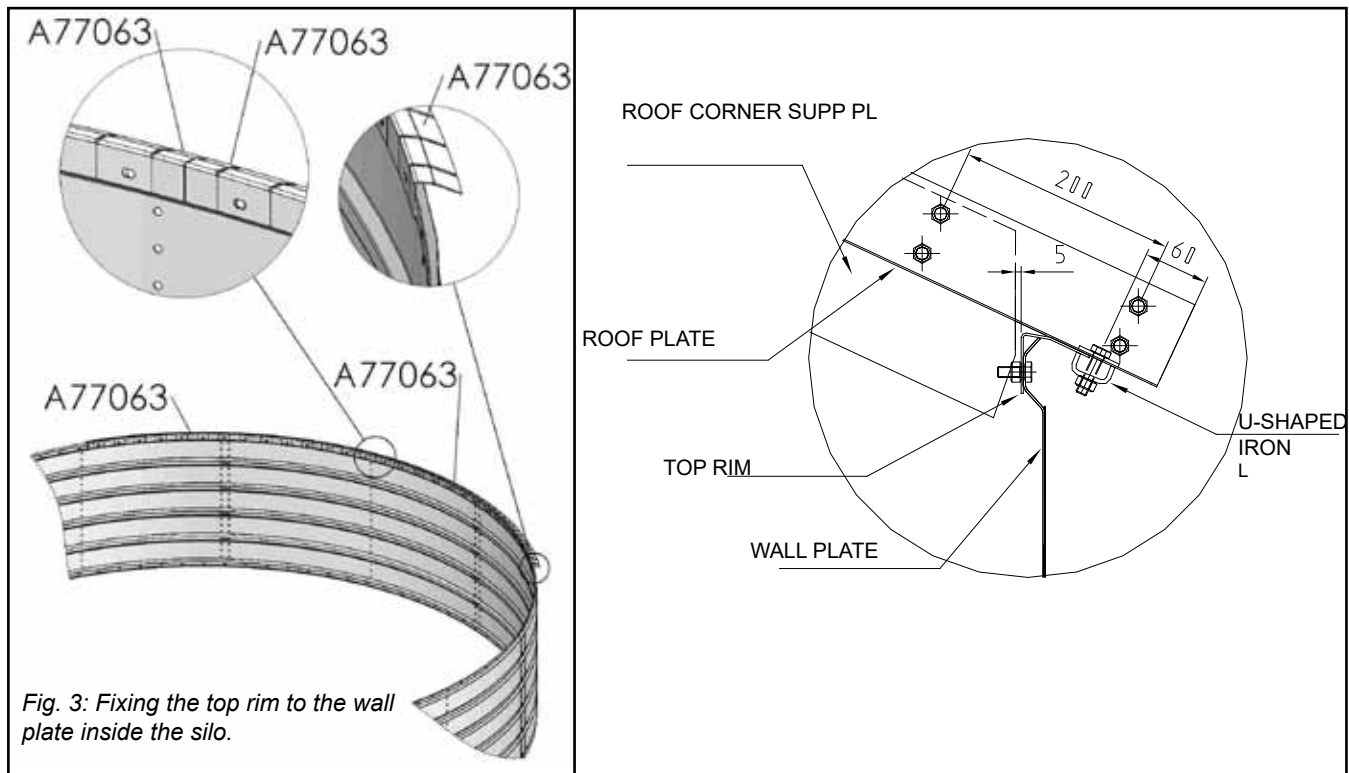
Fixing the top rim to the wall plate inside the silo.
